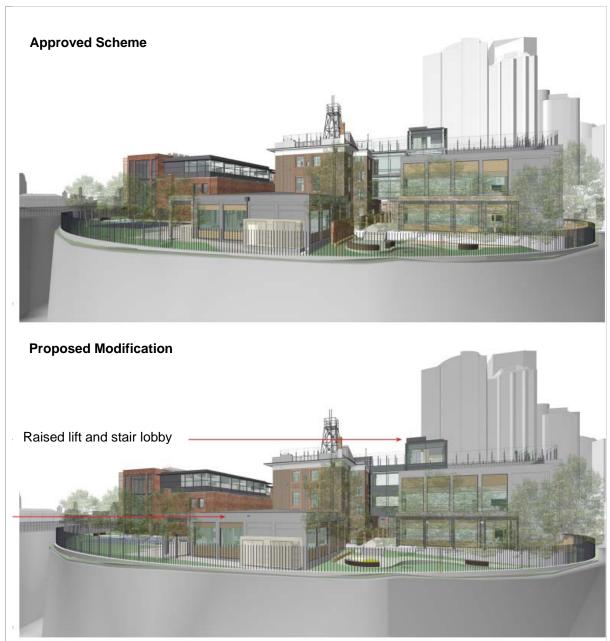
| View from the west (Source: Applicant's Architectural Design Statement)
